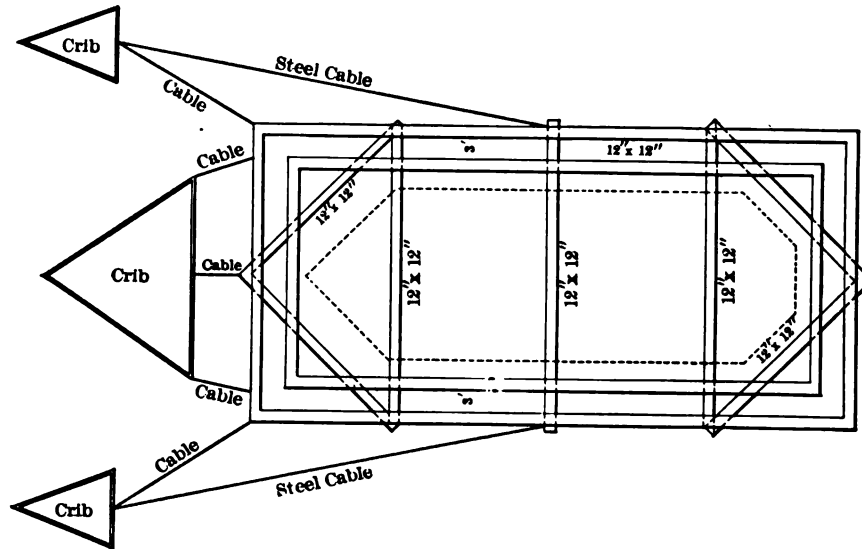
COFFER-DAM FOR INLET TOWER OF THE ST. LOUIS WATER WORKS.
